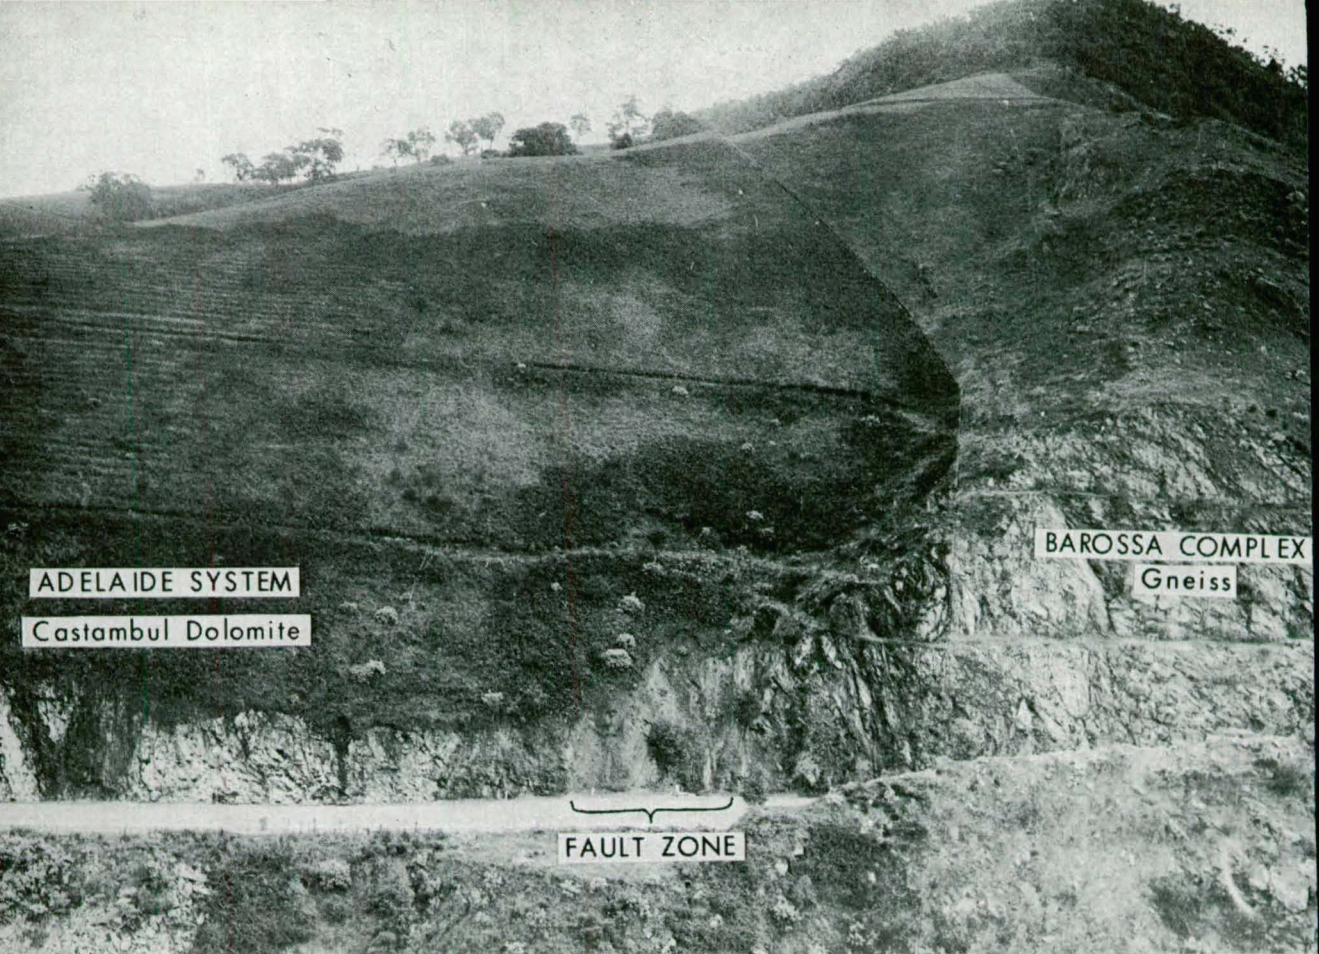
Prominent fault separating Adelaide System rocks from Barossa Complex rocks; Gorge Road deviation excavation, 4,000 feet downstream from Kangaroo Creek Dam.
